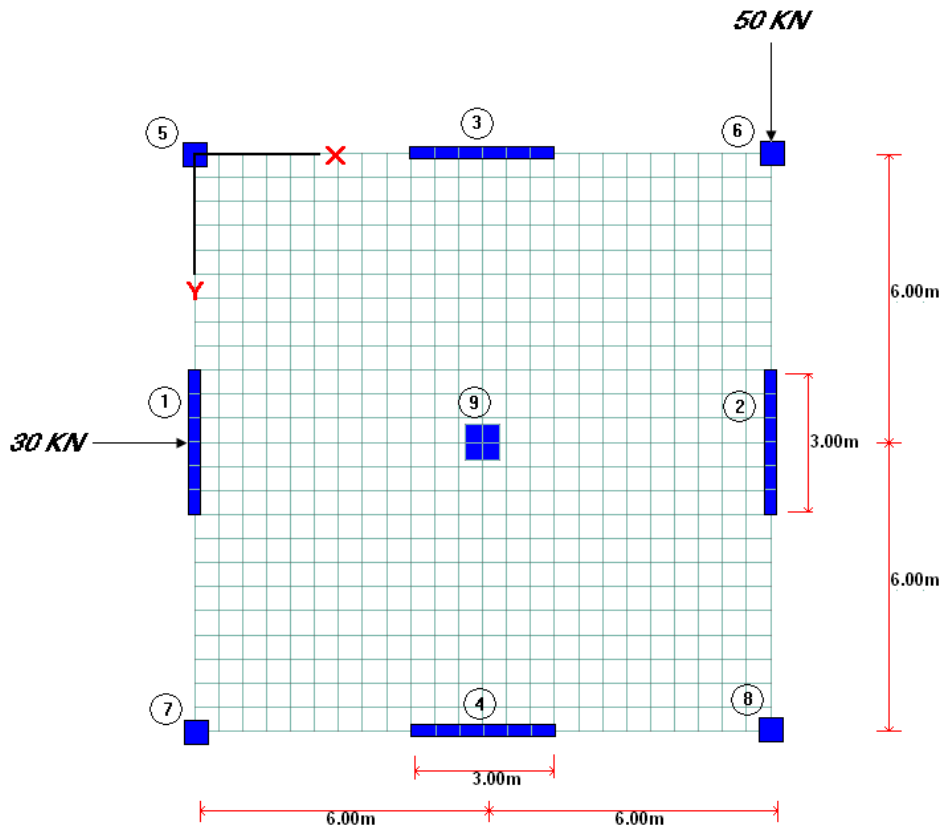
12m x 12m floor plan for 15 Storey, Square Building
